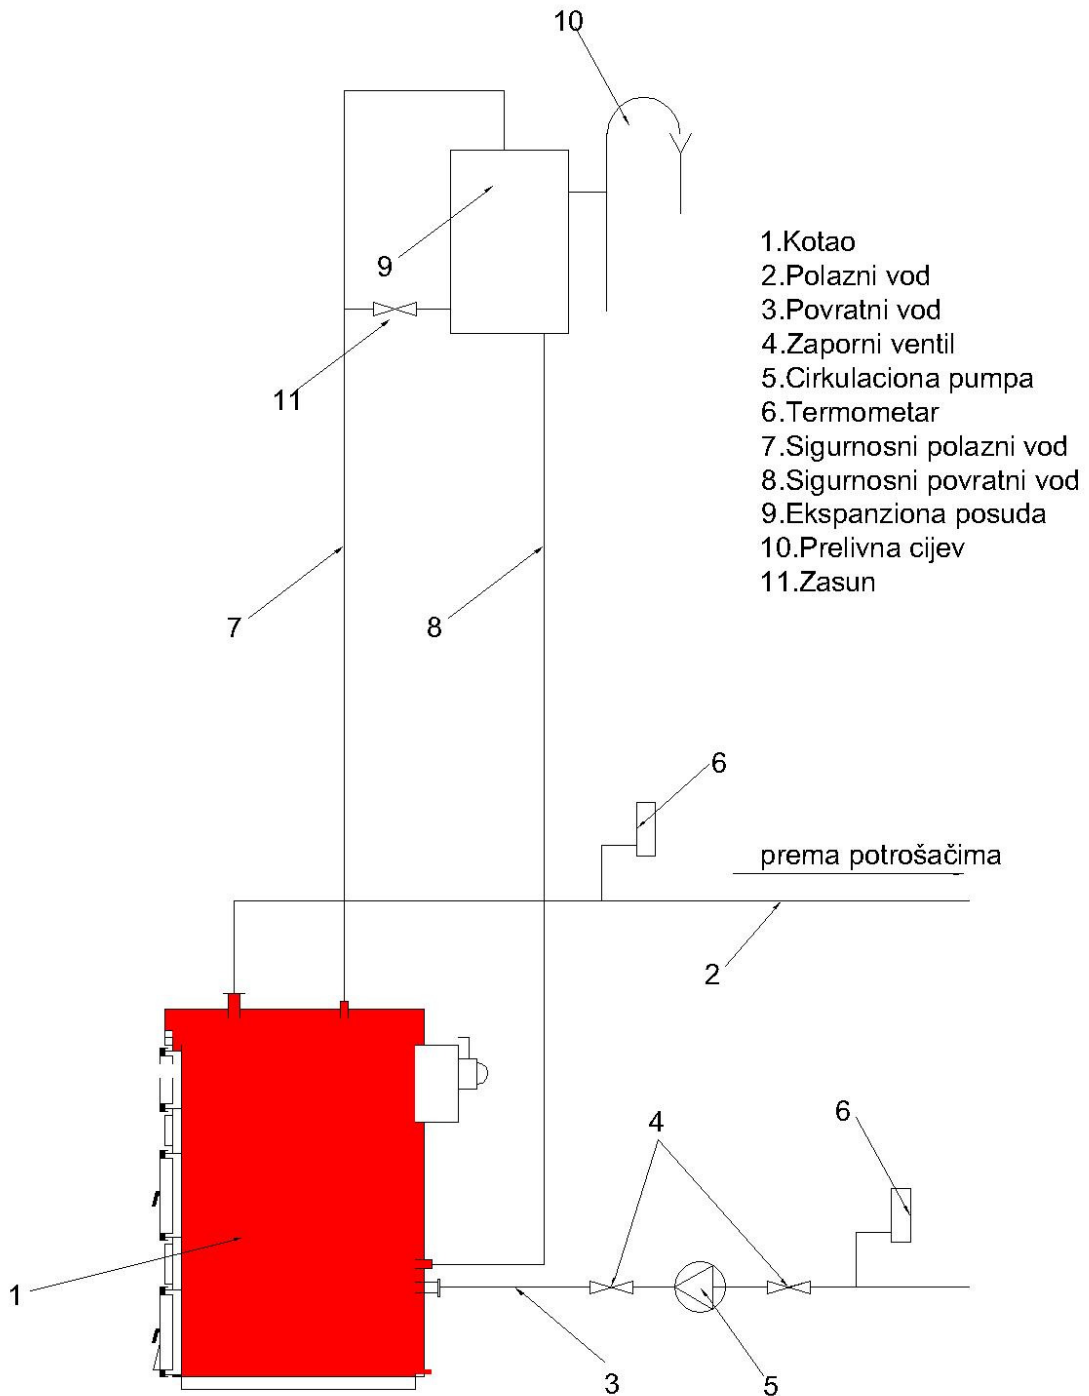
Connecting the boiler type on central heating installation with opened expansion container
